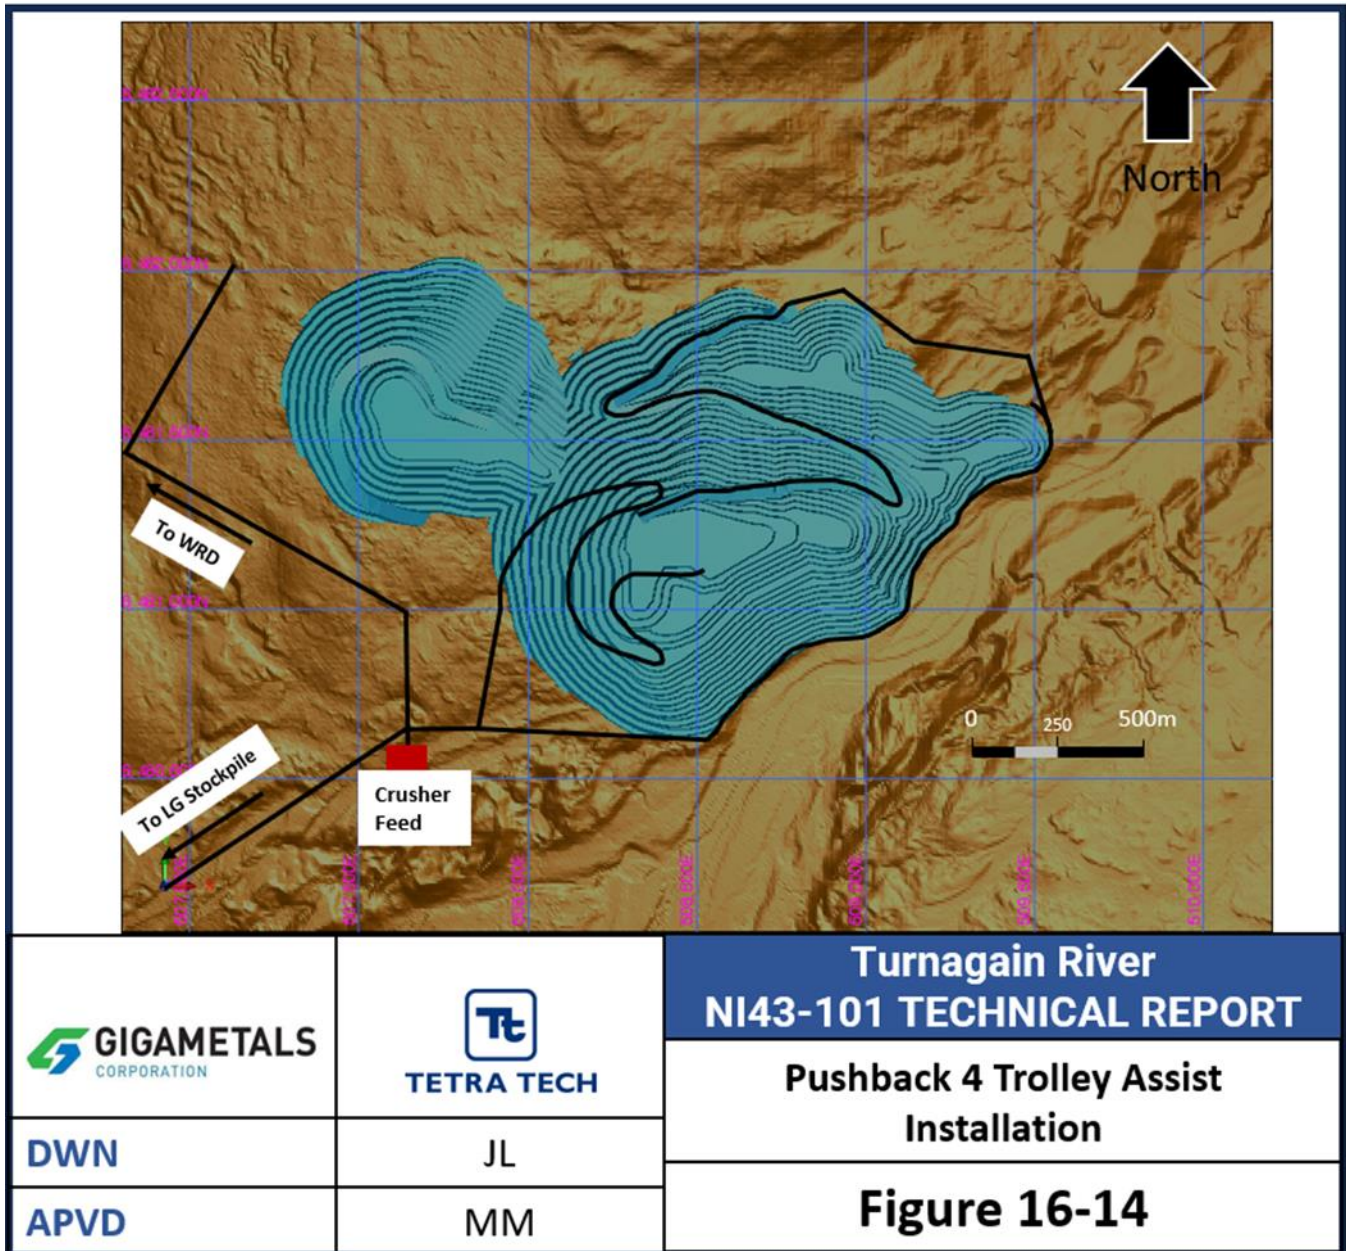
Pushback 4 Trolley-Assist Installation Plan
